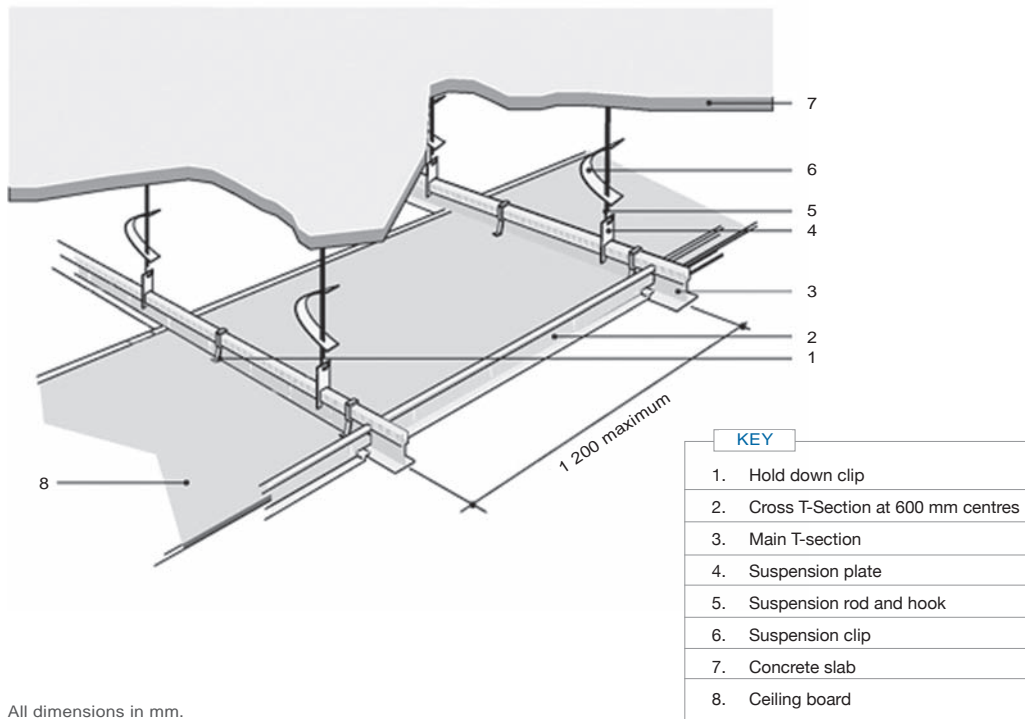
Grid layout for Nutec Suspended Ceilings using 1200 mm cross T-section
